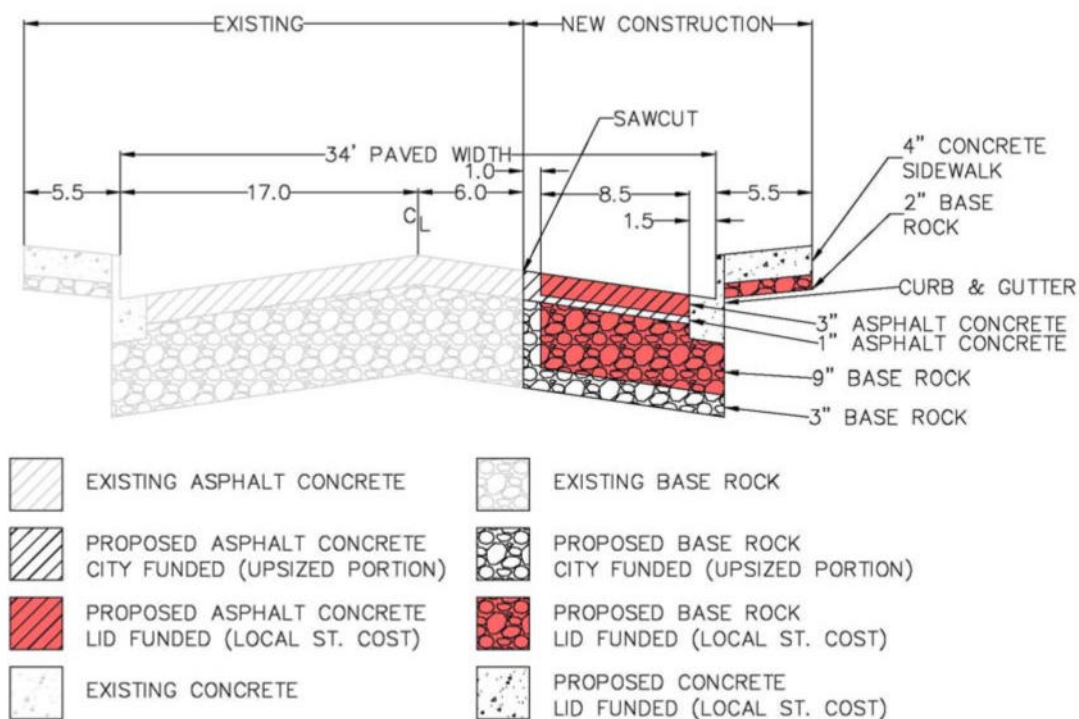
GROUP A CROSS SECTION (NORTH IS LEFT)
